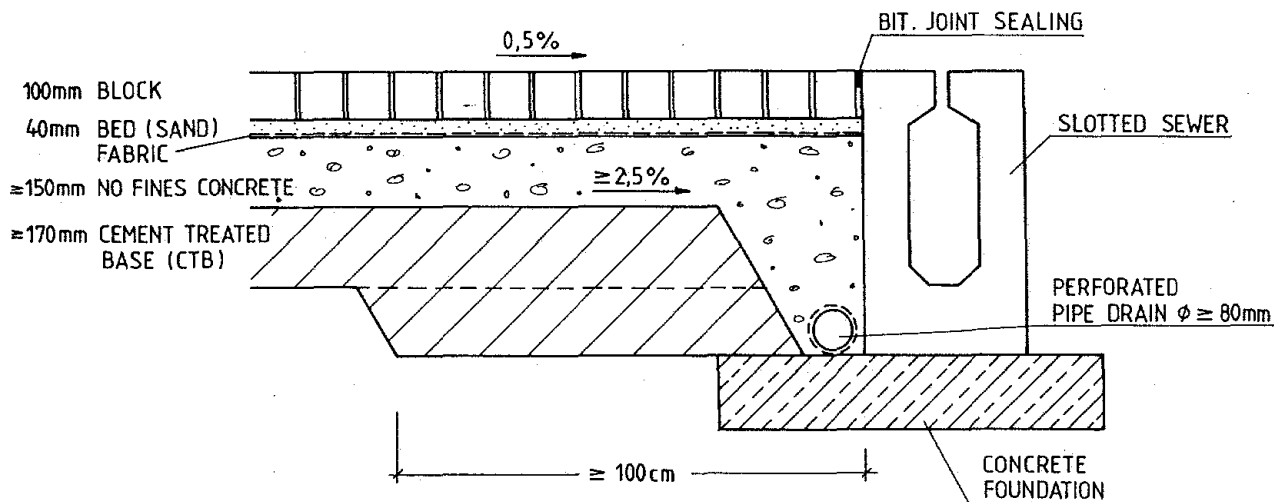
Heavy trafficked concrete block pavement structure with a base course of No-Fines-Concrete
